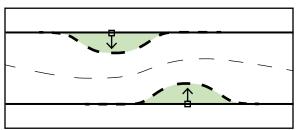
At the mid-block of a street, stormwater curb extensions can have be symmetrical or staggered orientation.
